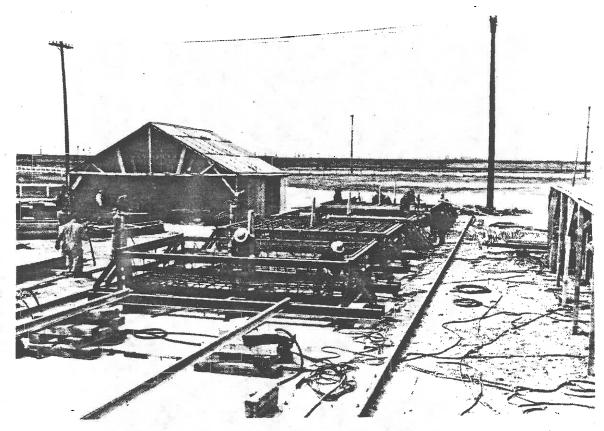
Reinforced concrete cell cover blocks being fabricated outside the 202-A (PUREX) Building, March 1954.
